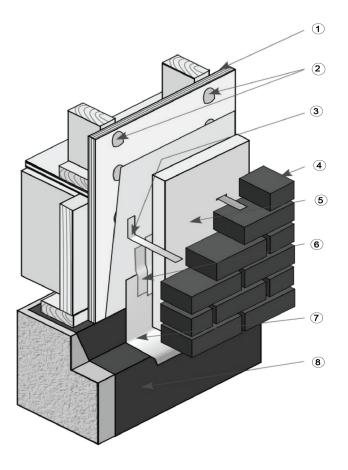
Product continuity at foundation walls and typical insulation with brick veneer cladding:
